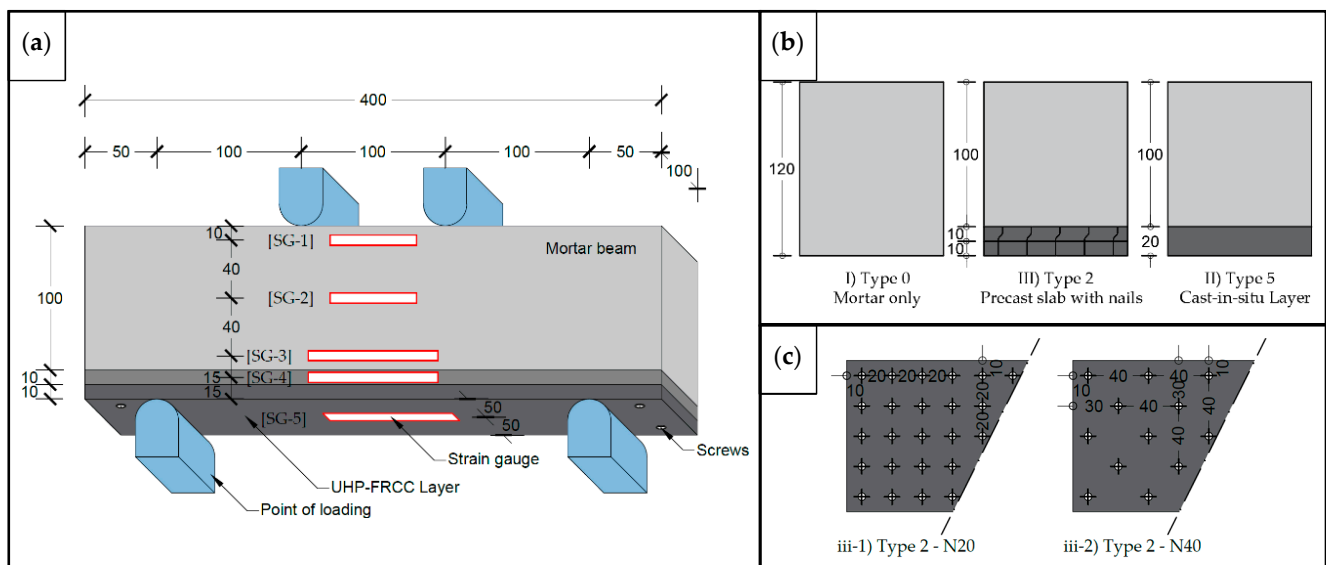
Mortar beams retrofitting by UHP-FRCC layer. (a) Specimens shape, strain gauges arrangement, and test configuration regarding the second test campaign; (b) Precast UHP-FRCC layers used to reinforce the beams; (c) Nail density on the surface of the type 2 precast layers for improving the connection between the parts.
